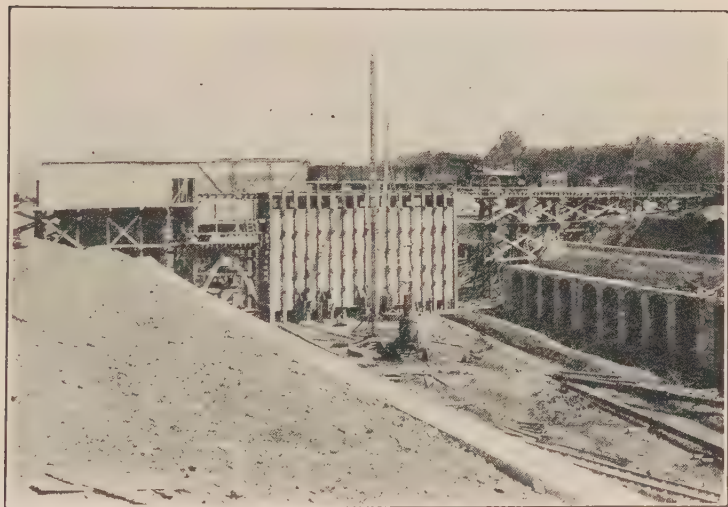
CONCRETE MINING PLANT. RECESSED RETAINING WALL UNDER CONSTRUCTION.
